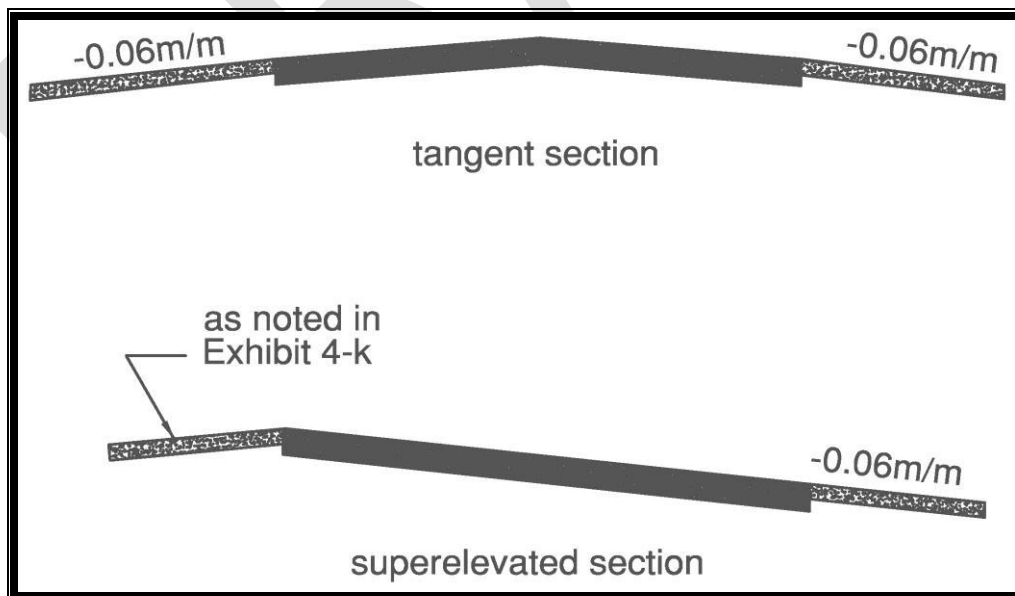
QSUPERELEVATION FOR SHOULDERS ON HIGH SIDE OF SUPERELEVATED SECTIONS
